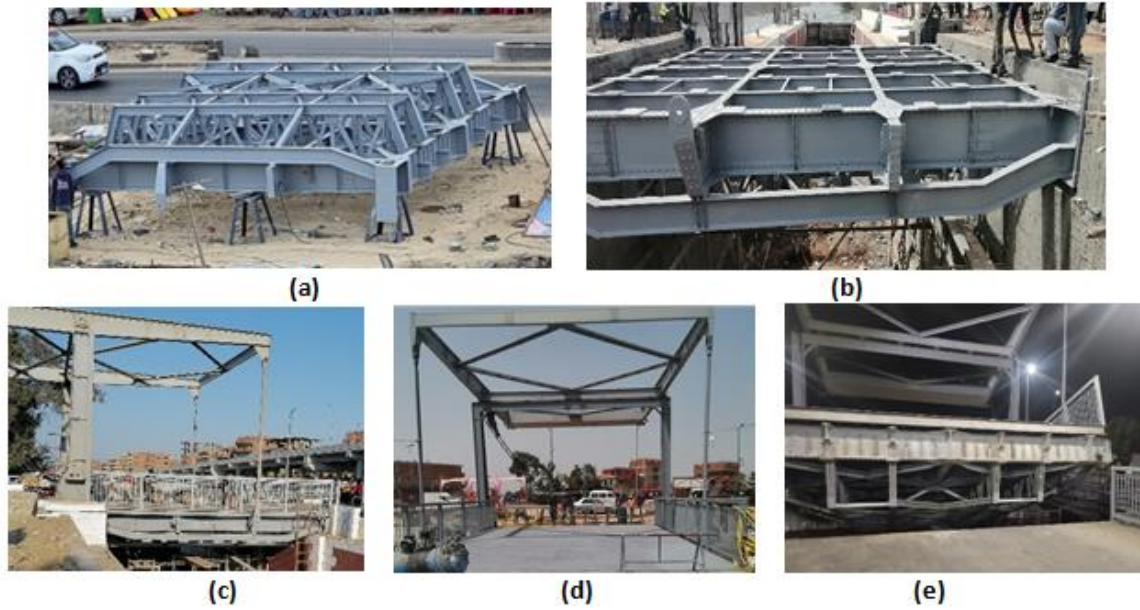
Bridge during, a) new truss system during fabrication, b) placement of strengthened bridge in desired location, c) and d) installation of all bridge components after repair, and e) bridge during opening trial test
